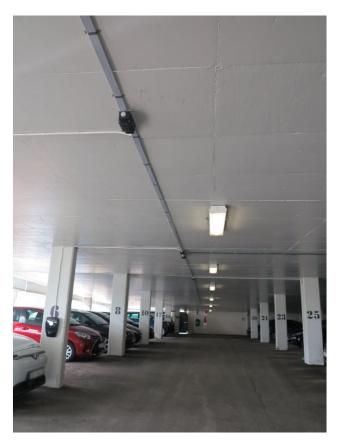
Two main cables on each floor supply power to the charging units (flat cable in the ceiling, middle of picture). Cables are laid from the main cable to the charging units. The electrical system has capacity for all of the parking spaces to be connected to the charging system. Car owners are free to choose whether they want to connect to the system, but need to connect to the system if they wish to charge a vehicle in the garage.
